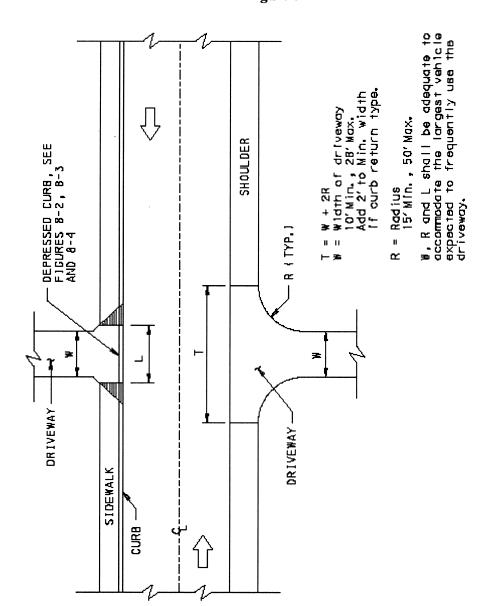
TYPICAL MINIMUM USE DRIVEWAY
